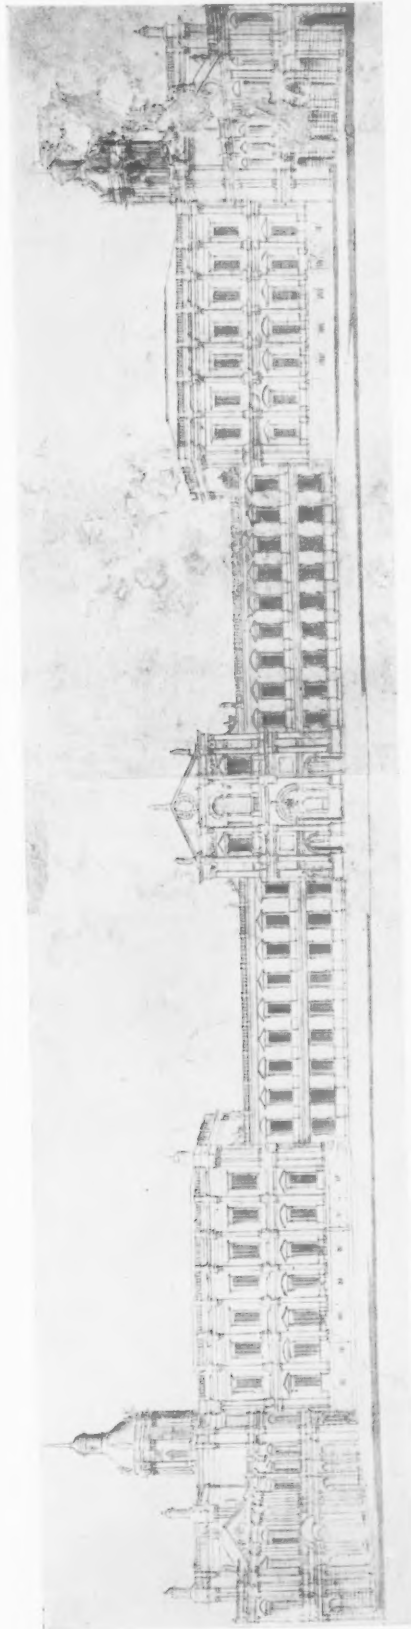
WEST ELEVATION OF THE PLAN SHOWN BY FIG. 14
